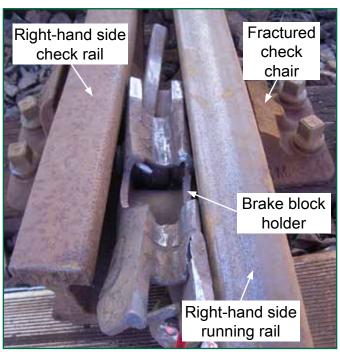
The detached brake block holder and the check rail flangeway – the brake block holder has been replaced into this position post-incident for photographic purposes
